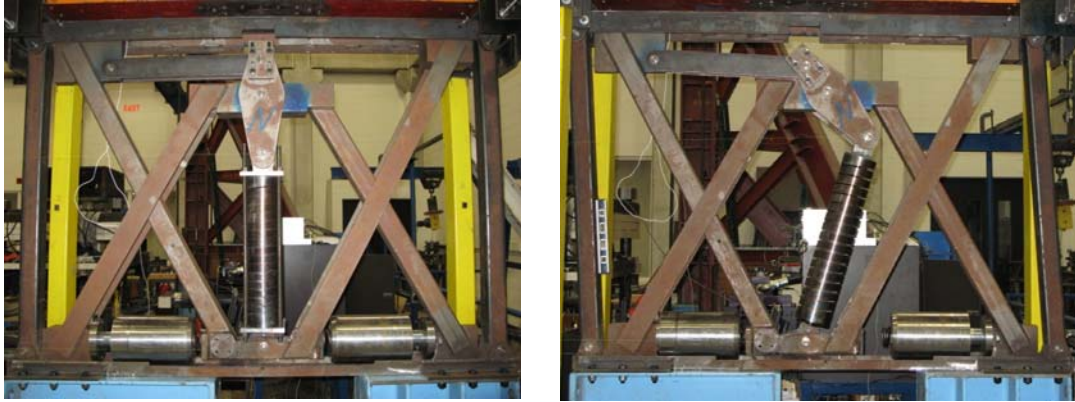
Undeformed and deformed shape of the NSD inside load frame at University at Buffalo
